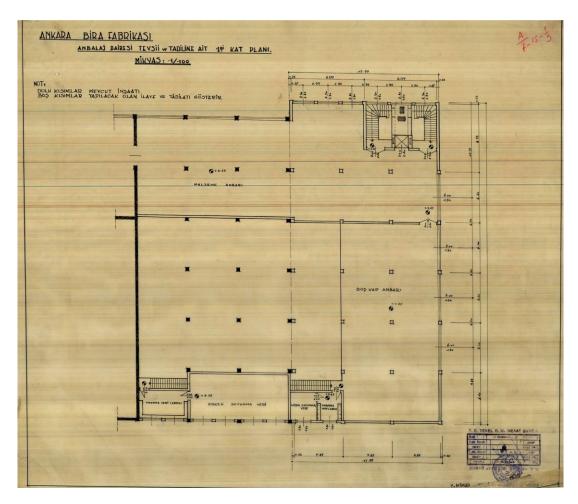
Drawing of the addition in the beer filling building, first floor plan, Talat Güreli, master architect worked in the Construction Section in General Directorate of TEKEL (Source: TTA Archive)
